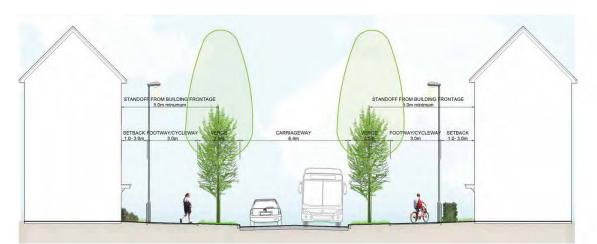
Tree Planting Section showing tree planting minimum 5m from building frontages
